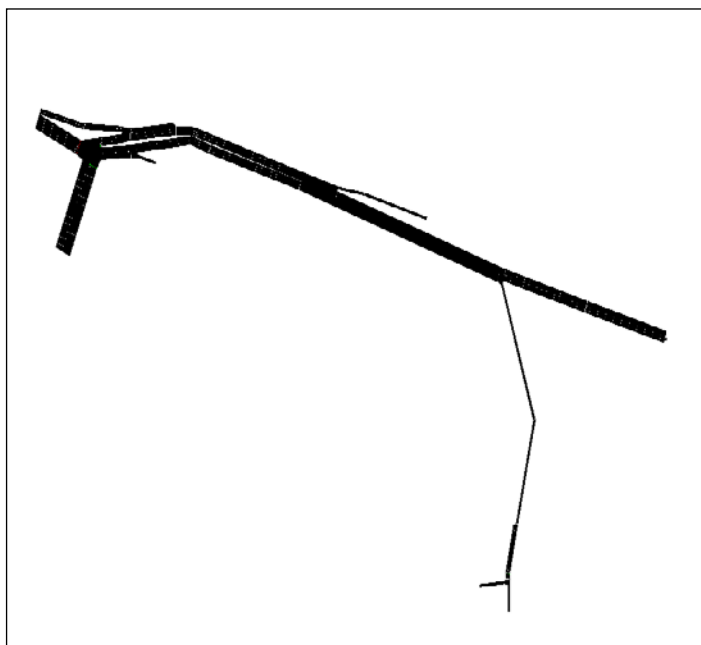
Road model of the Altstadttringtunnel in Munich
